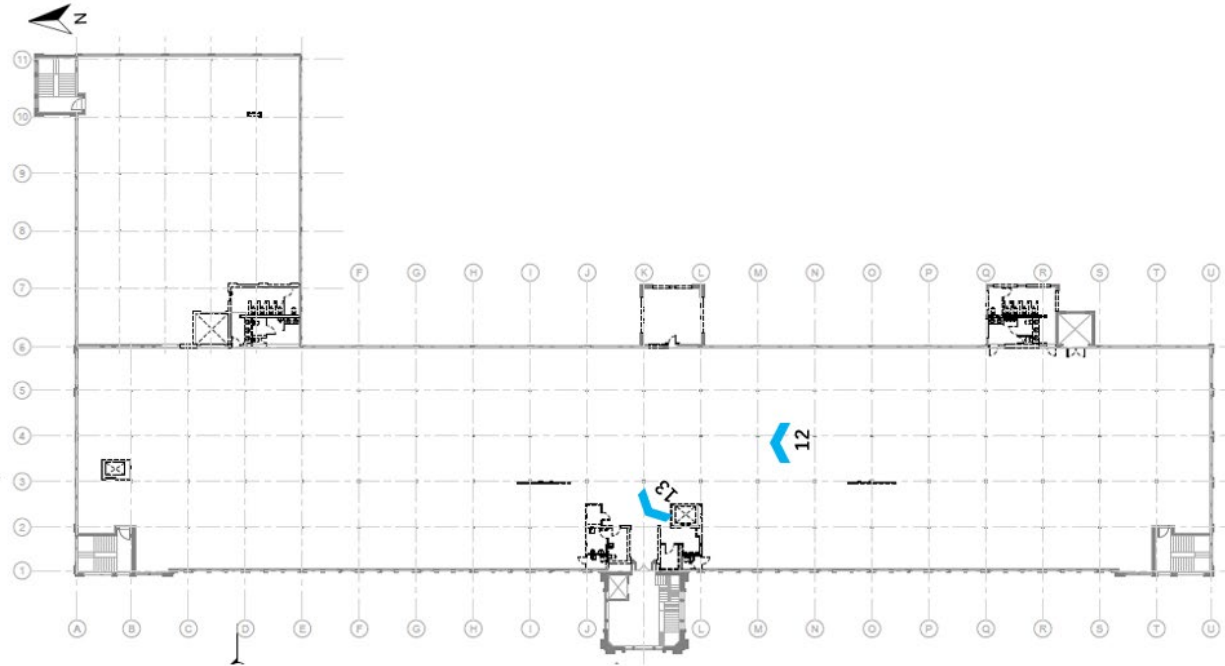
Photo Key Plan – Main Office/Factory Building – Second Floor
